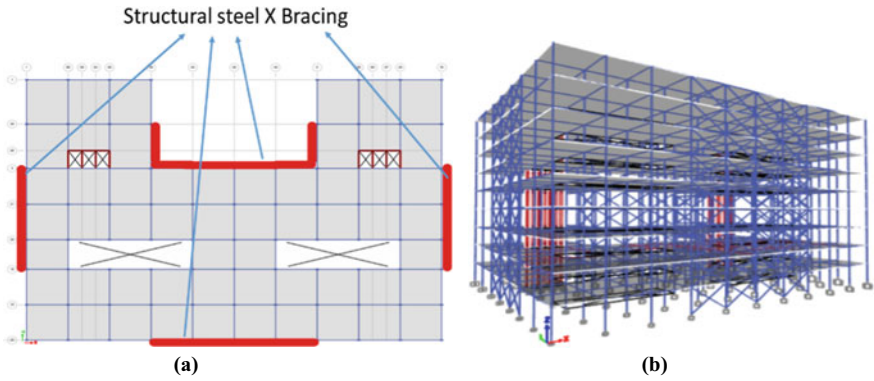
Hospital building retrofitted globally with X bracings where plastic hinges have developed in structural members due to earthquake loading: a plan and b isometric view
